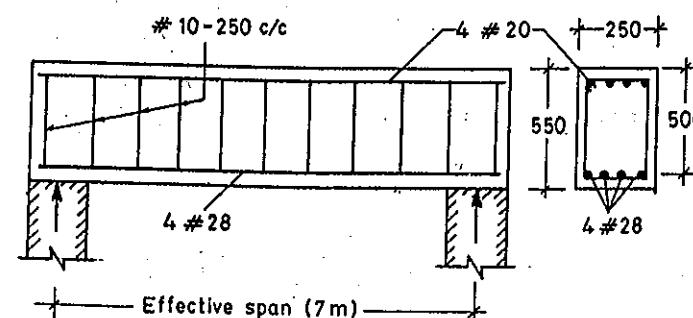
Reinforcement Details in Doubly Reinforced Beam
